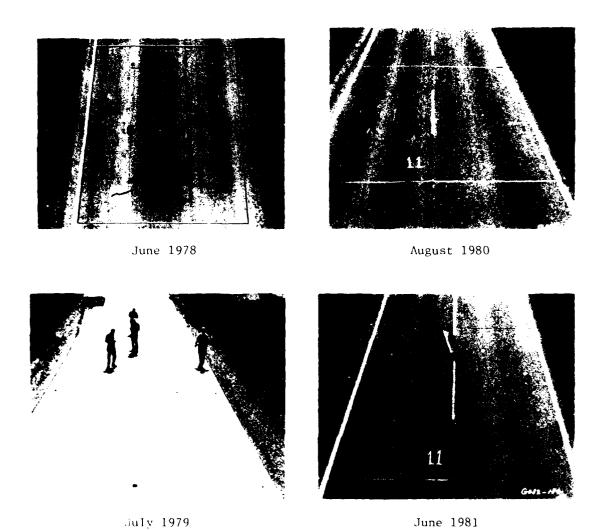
Sahuaro rubber section, north end of Wilderness Road
